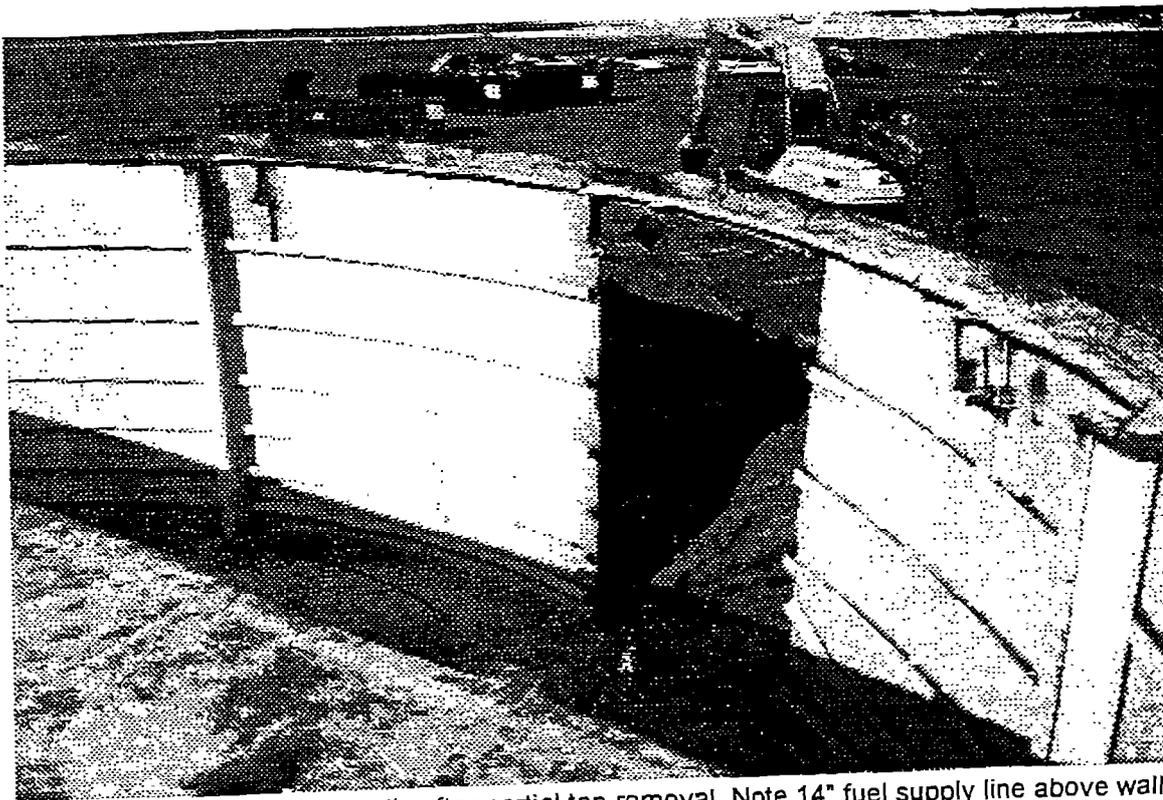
Day tank internal walls after partial top removal. Note 14" fuel supply line above wall near access.
